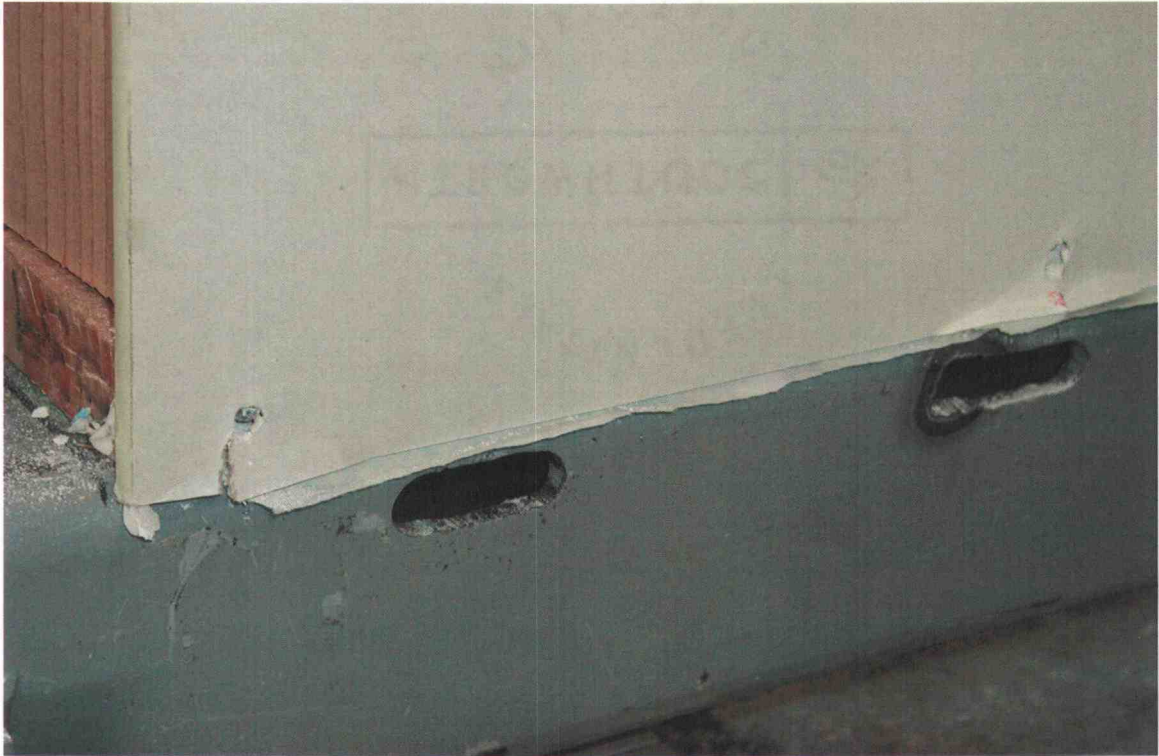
GWB panel separated from sill plate and end stud due to screw fracture, localized GWB crushing, and edge breakout of GWB
